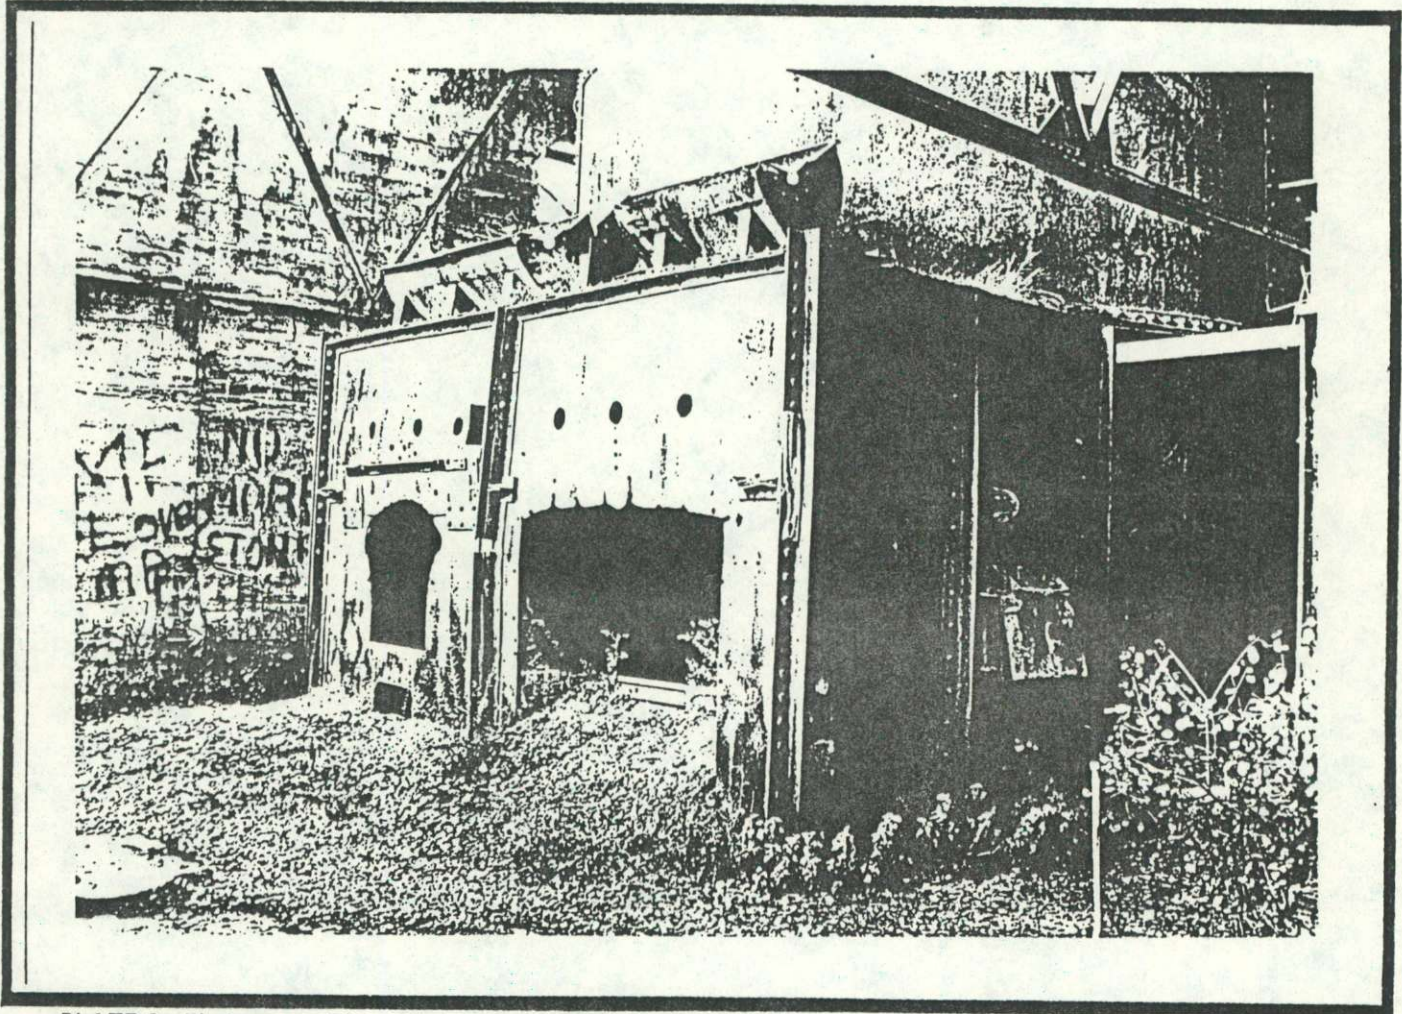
Fireboxes on Firing Floor of Kiln Building, Showing Steel Cladding
